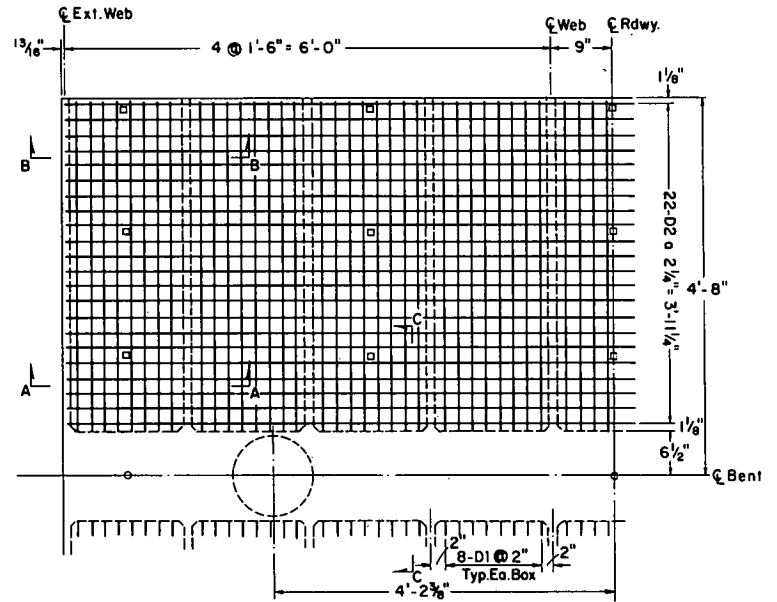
Plan of Bottom Layer of Deck Reinforcement for DC-9
